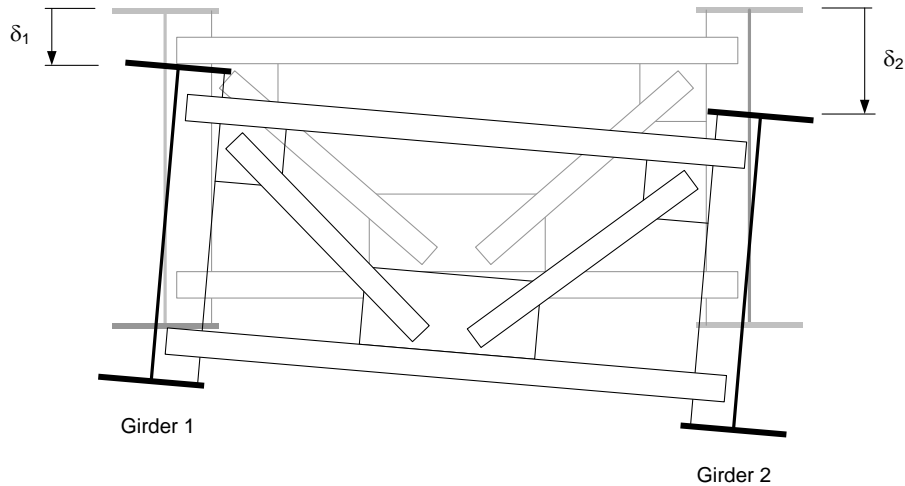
Cross frame, bridge cross section, and girder torsional rotations due to differential girder displacements in skewed bridges (Coletti and Yadlosky 2005).
